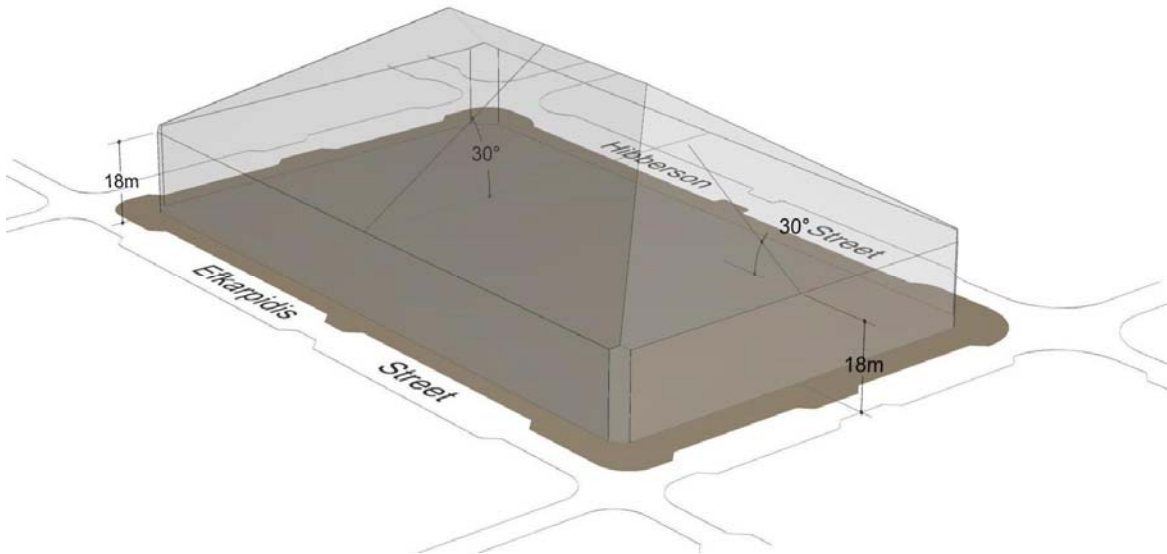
Building envelope in Precinct 1a (north of Hibberson Street)
